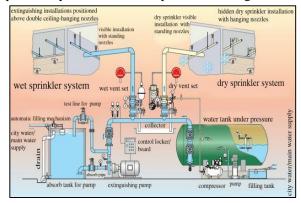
Scheme of sprinkler installation (figure source: http://www.virsistem.co.rs/gasenjepozara/ sprinkler/)
